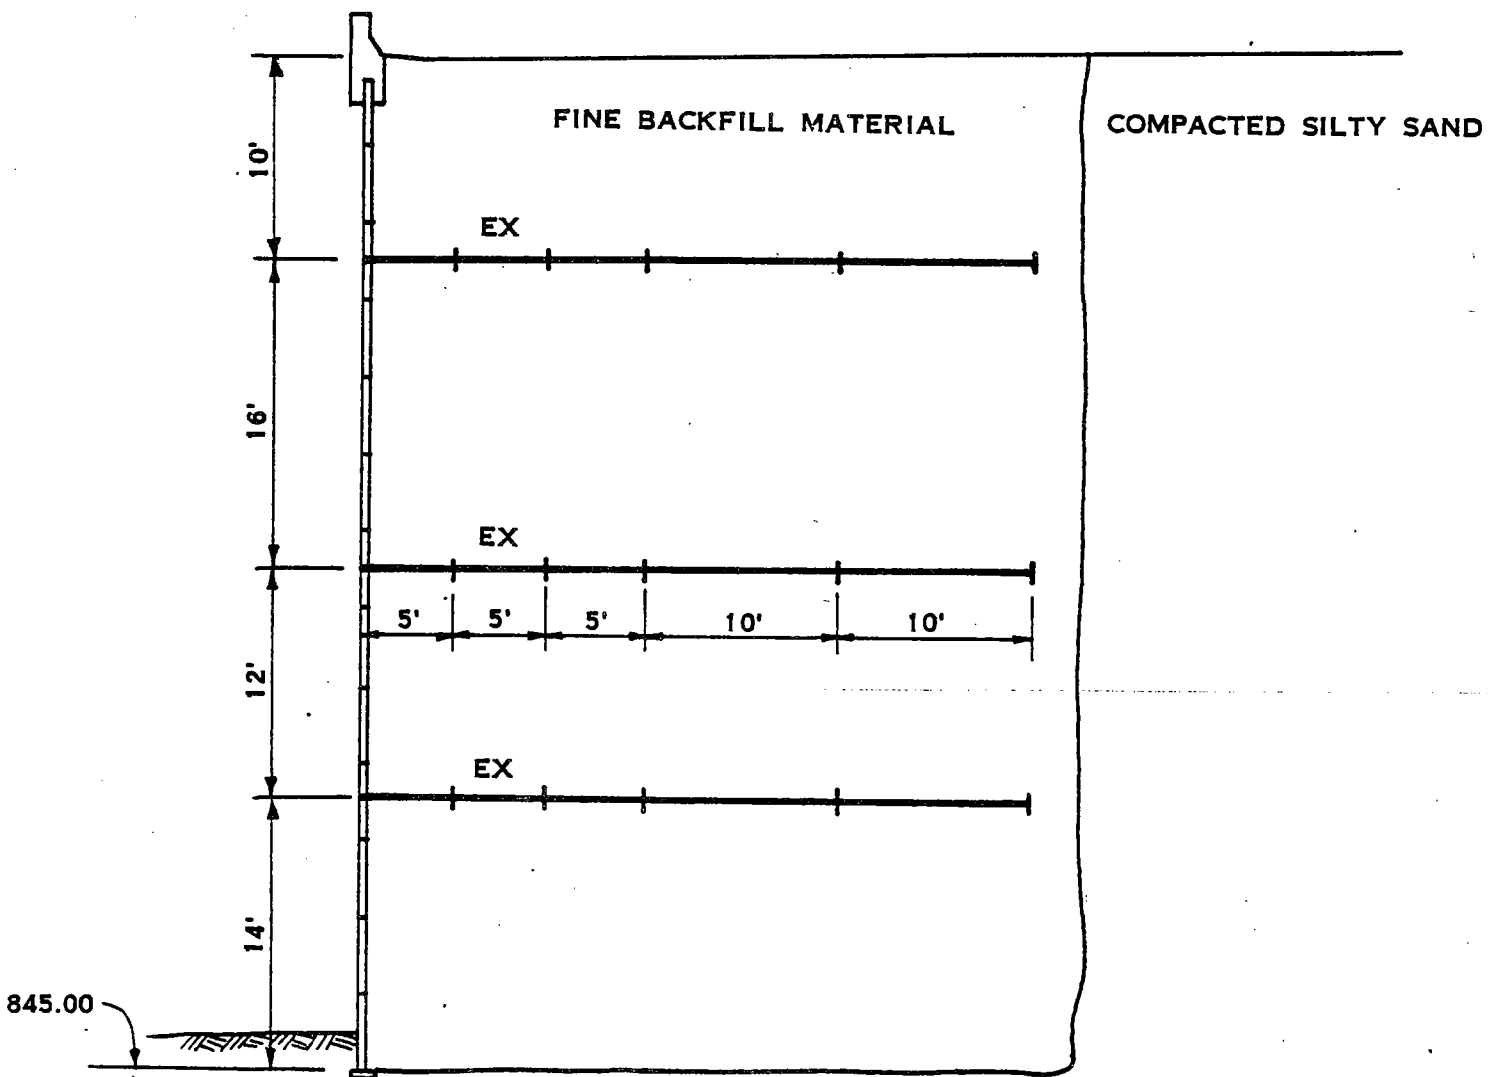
CROSS SECTION OF INSTRUMENTED SECTION A
